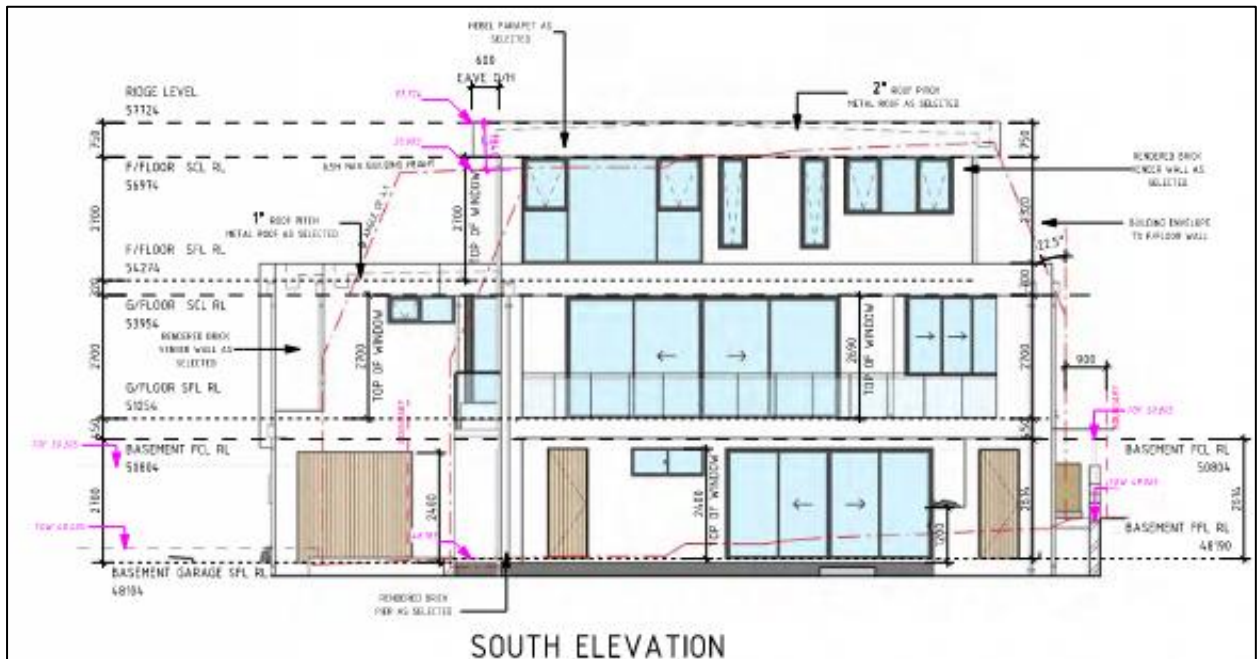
Proposed exceedance to Clause 4.3 of NLEP2012 (south elevation)
